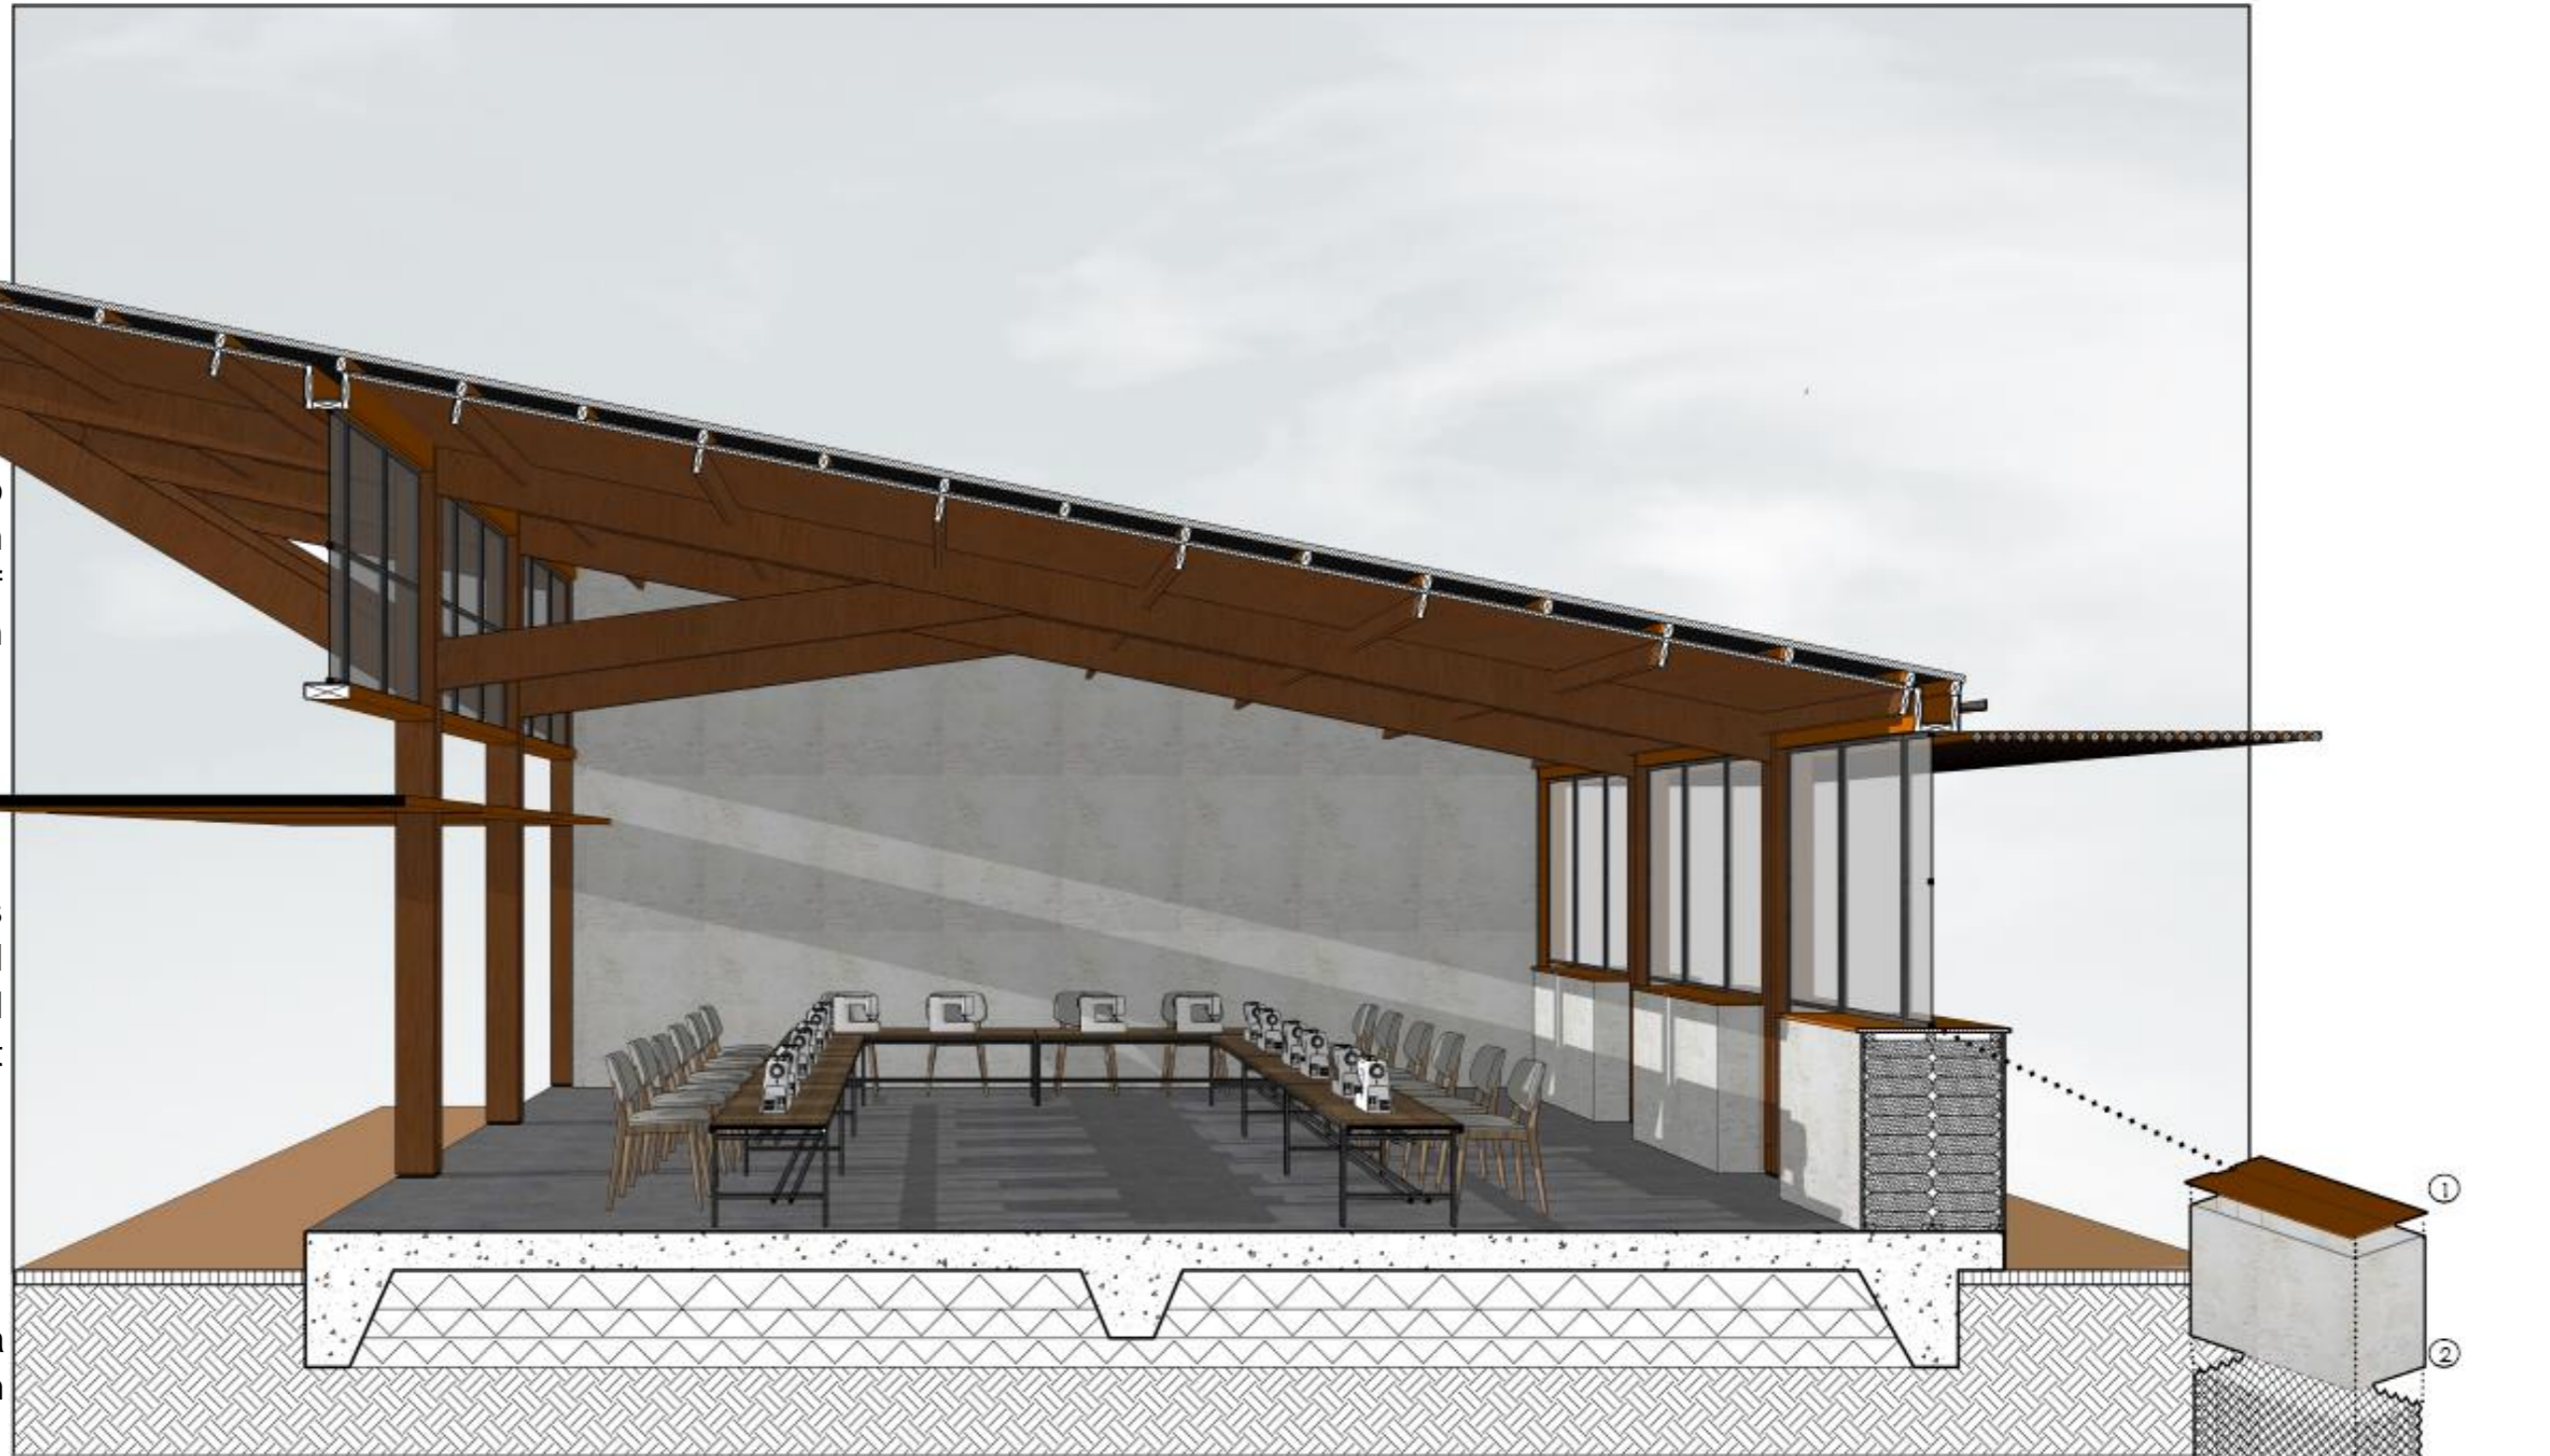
Detail section of a multifunctional classroom (by the author, 2022)
